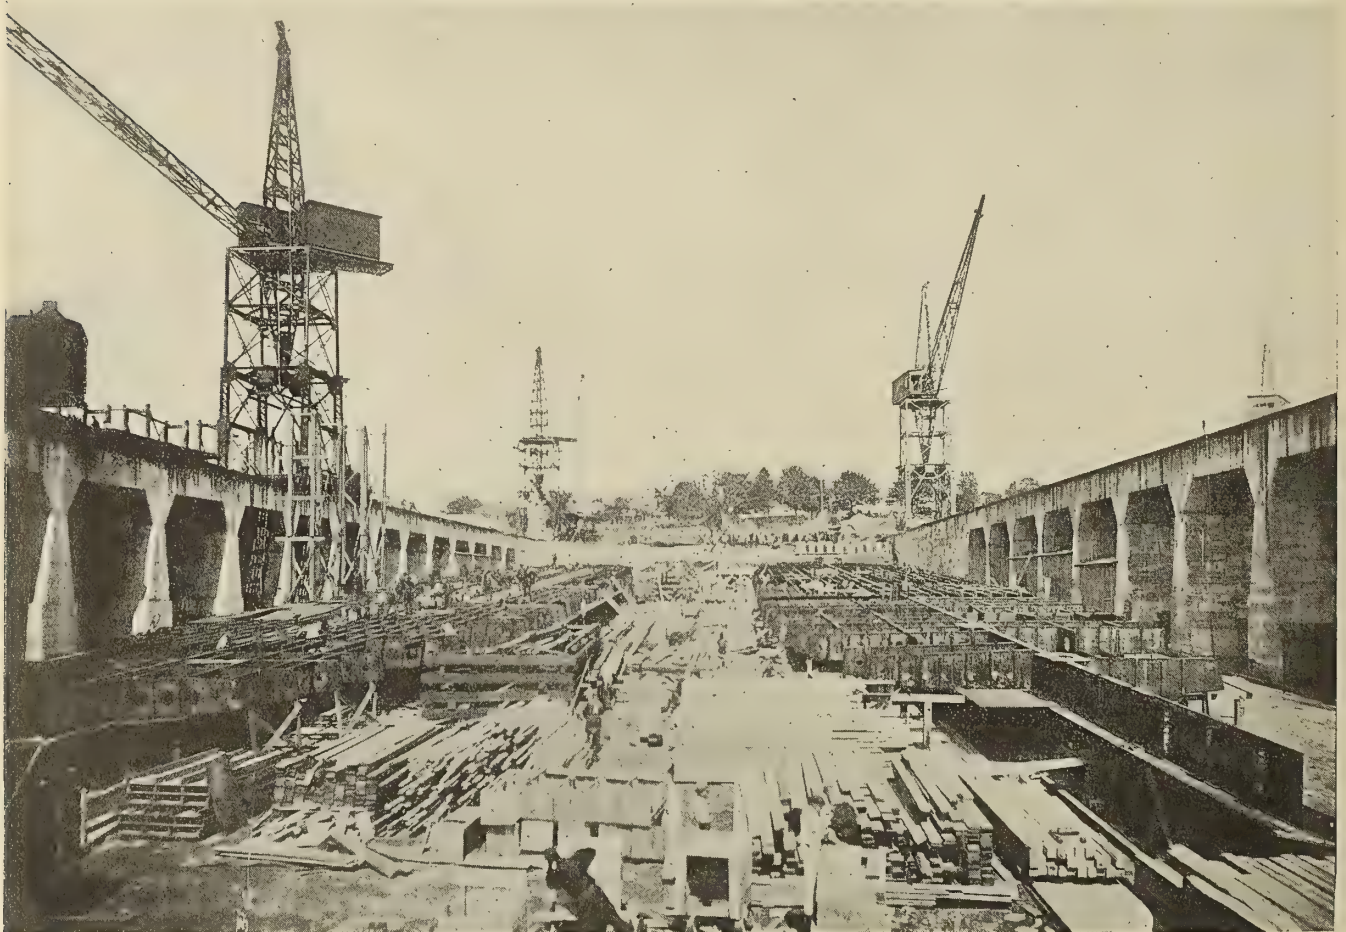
Two of the Concrete Shipways, Showing Construction of Concrete Crane Runways
